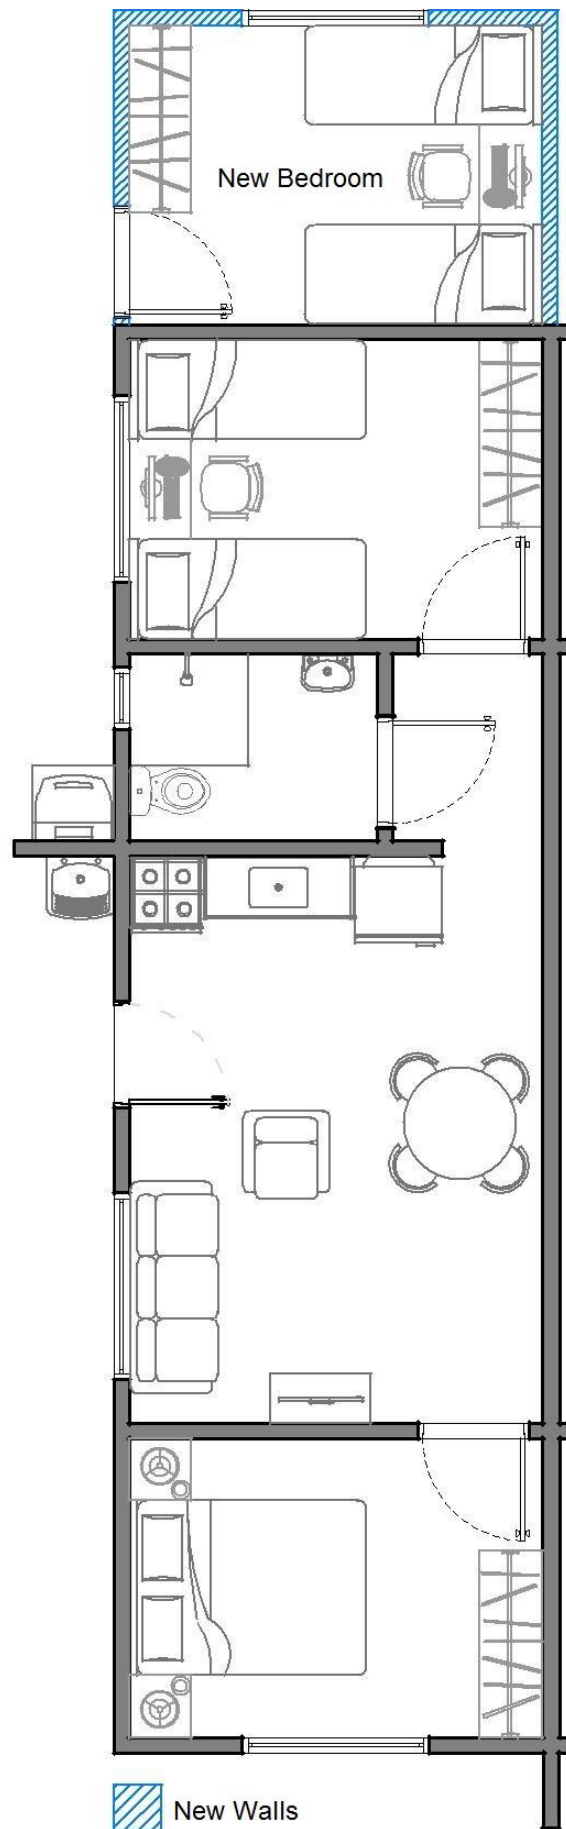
Floor plan of the standard house of Celina Jallad estate, with one extra bedroom.
